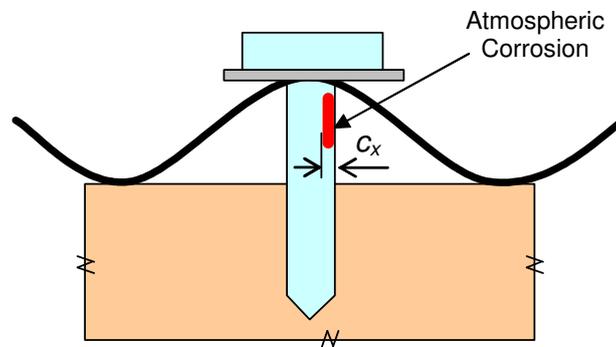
Fastener connecting the corrugated roofing to wooden rafter (red mark shows the shank is subject to the most severe corrosion).
